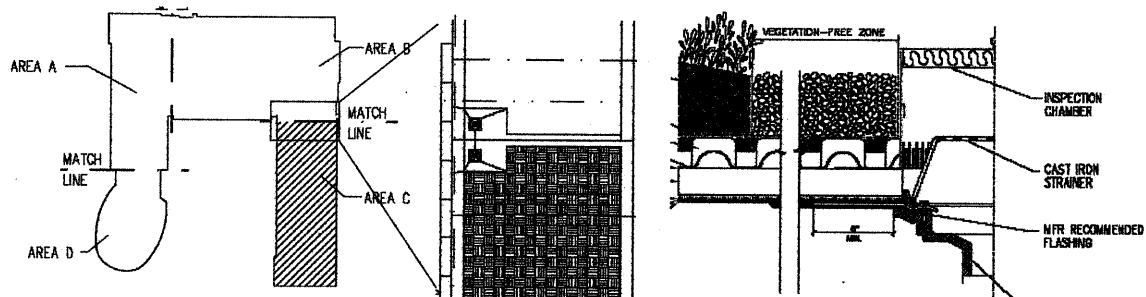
(left) Business instructional Facility with green roof location, (middle) plan view of green roof and conventional roof with two downspout locations, (right) cross section of green roof and drain.
